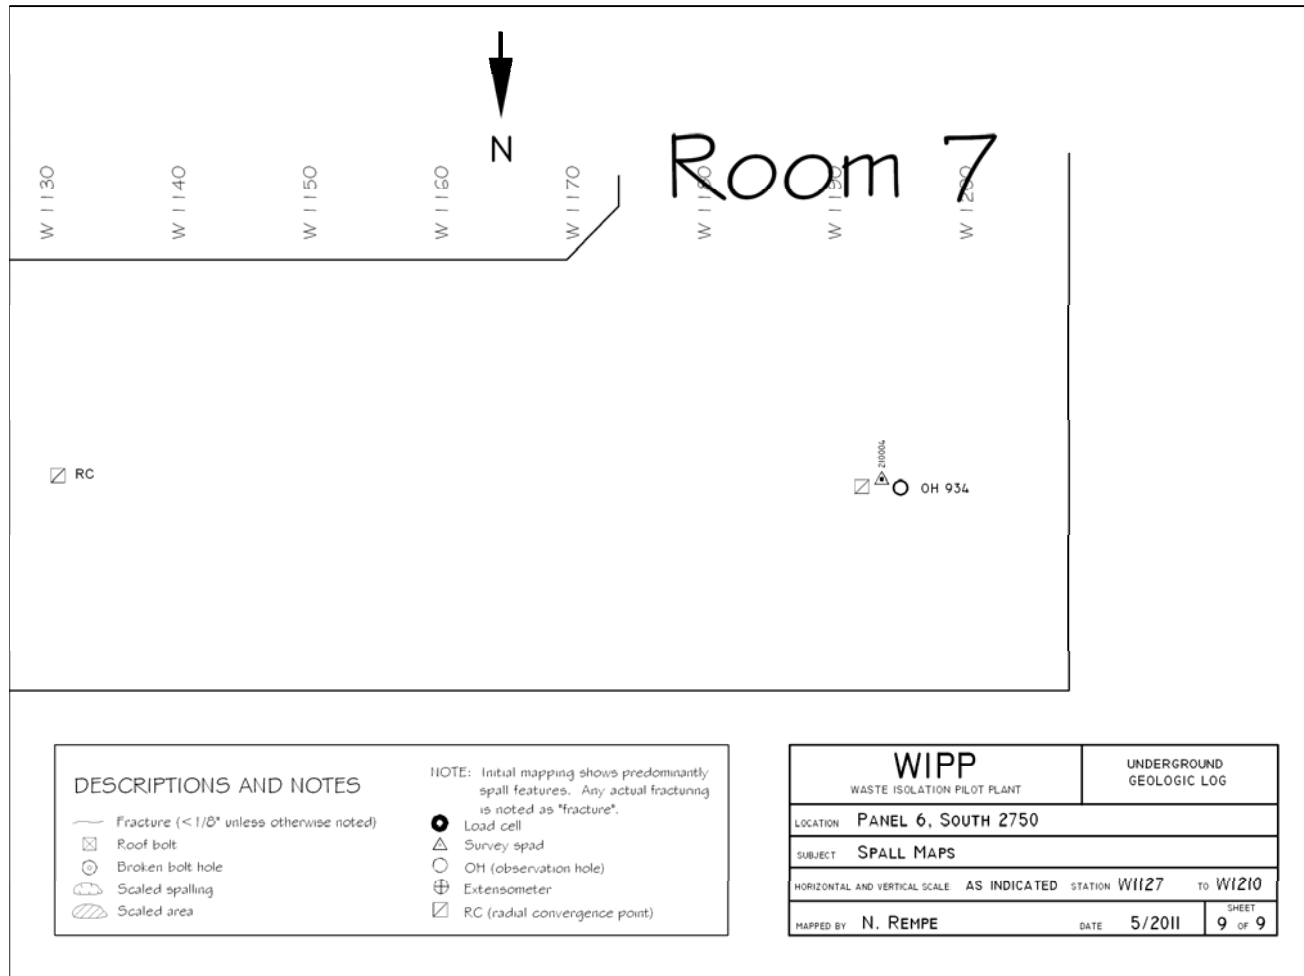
Panel 6 S2750, W390-W1210 Roof Fractures (Sheet 9 of 9)
